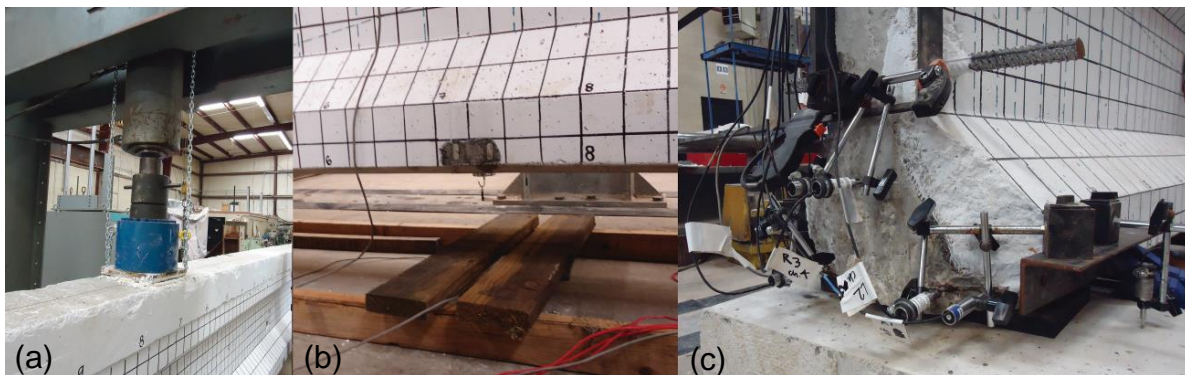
(a) Load application point and 400 kip load cell, (b) wire potentiometers used for monitoring deflection and setup used to protect them from debris, and (c) LVDTs and brackets used for monitoring strand slip and support deflection
